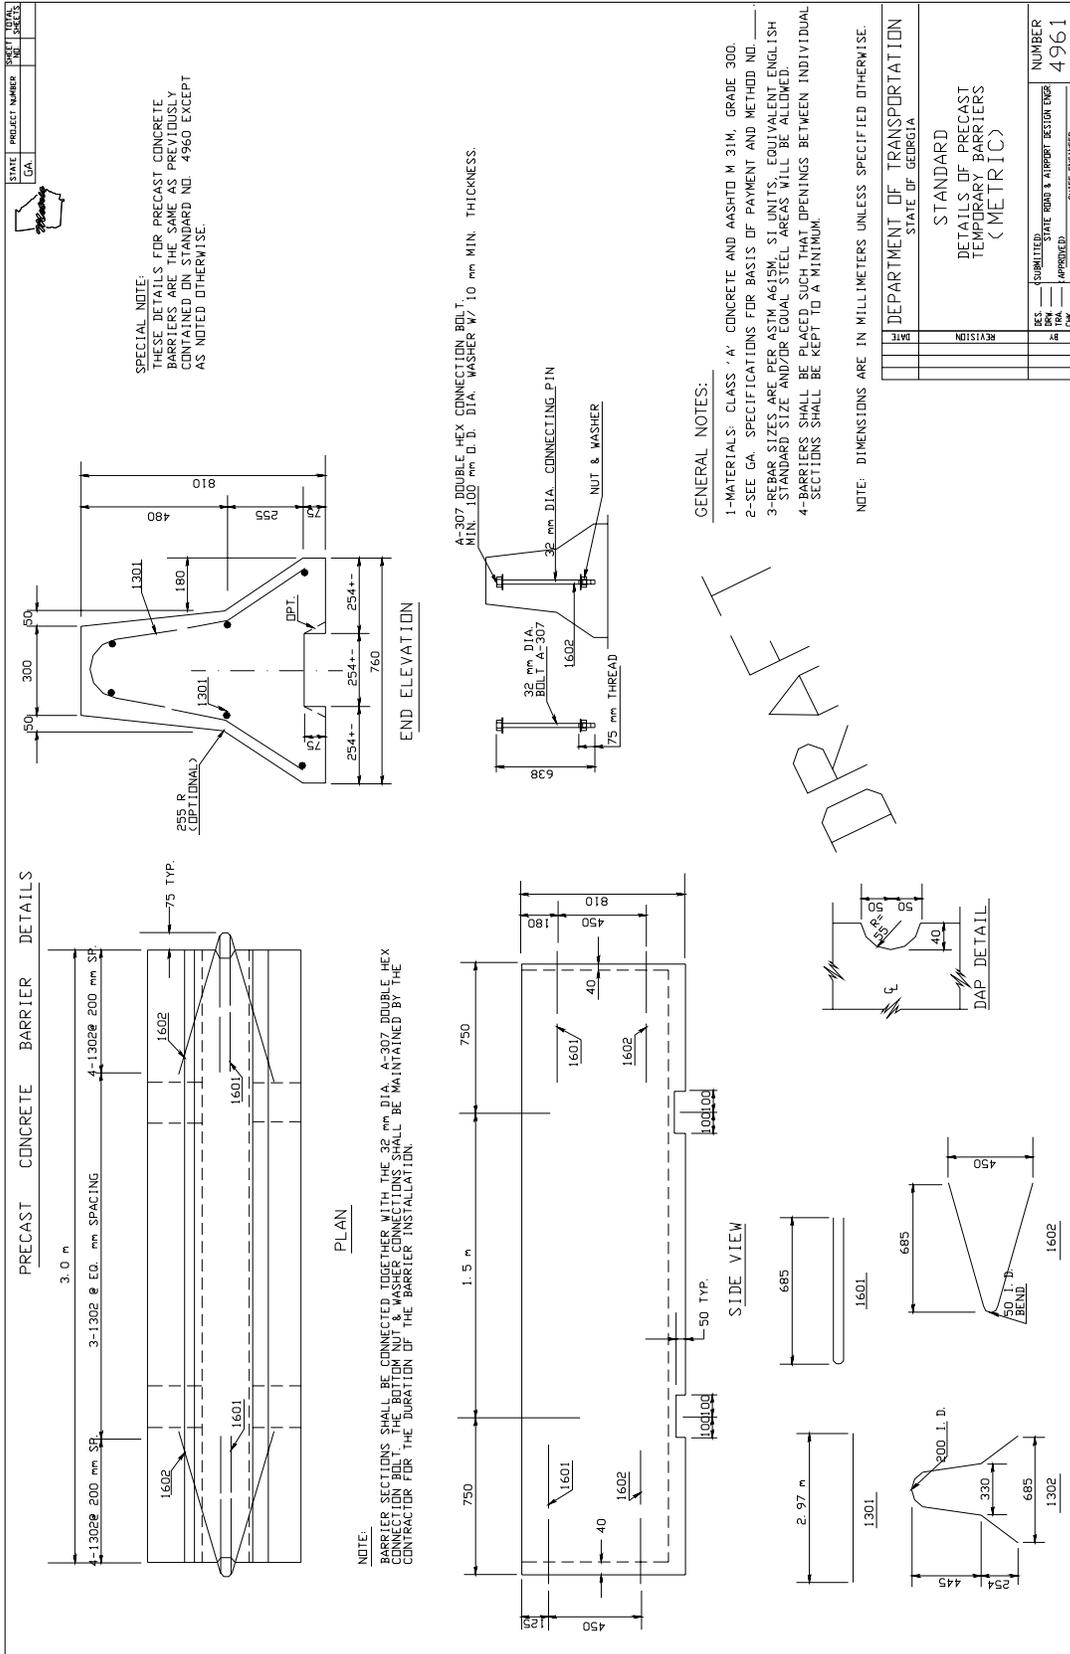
Details of the Georgia Temporary Barrier with pin and loop connection.
